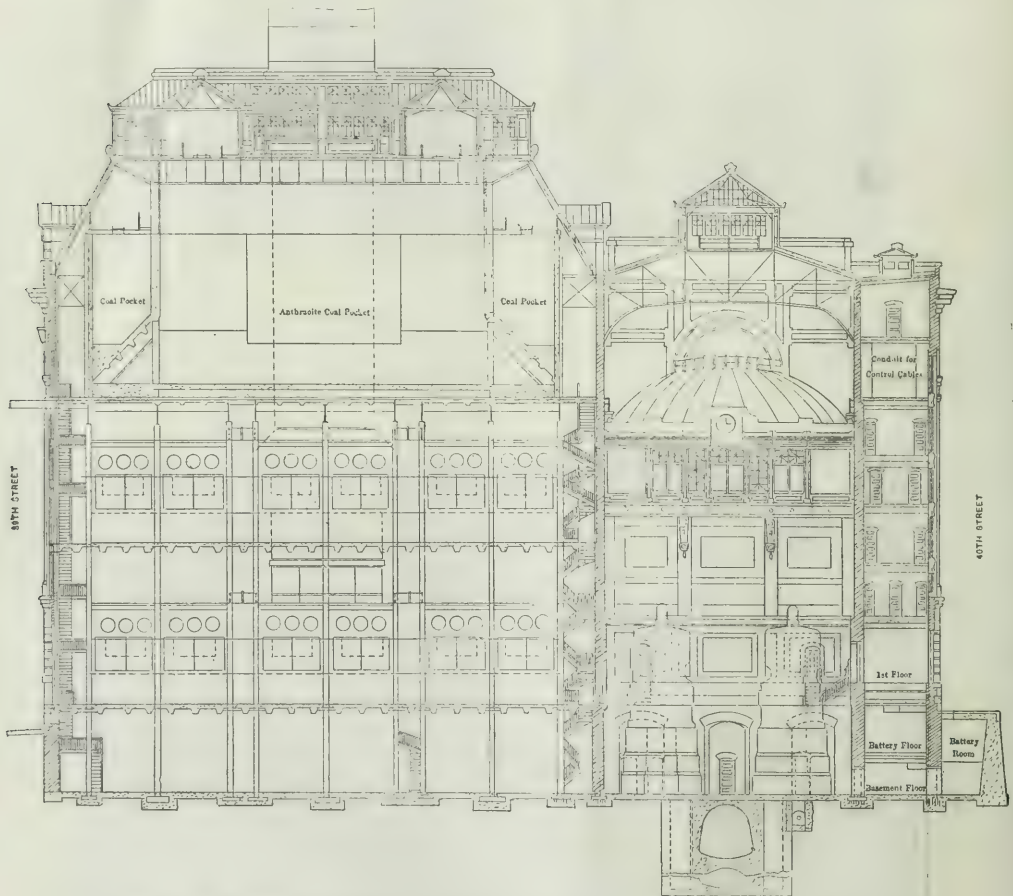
CROSS-SECTIONAL ELEVATION OF WATERSIDE STATION NO. 2 OF THE NEW YORK EDISON CO.
